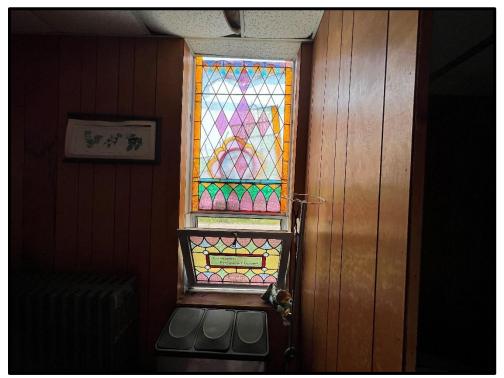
7119 Tecumseh Road Interior – Broken and Collapsed Stained Glass Window (Photo taken July 22, 2022)
